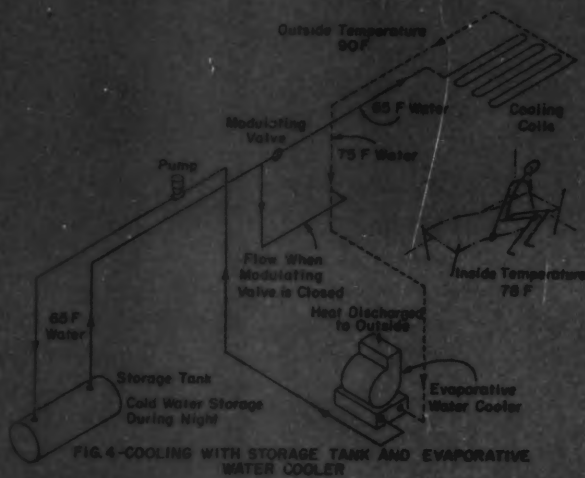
COOLING WITH STORAGE TANK AND EVAPORATIVE WATER COOLER
